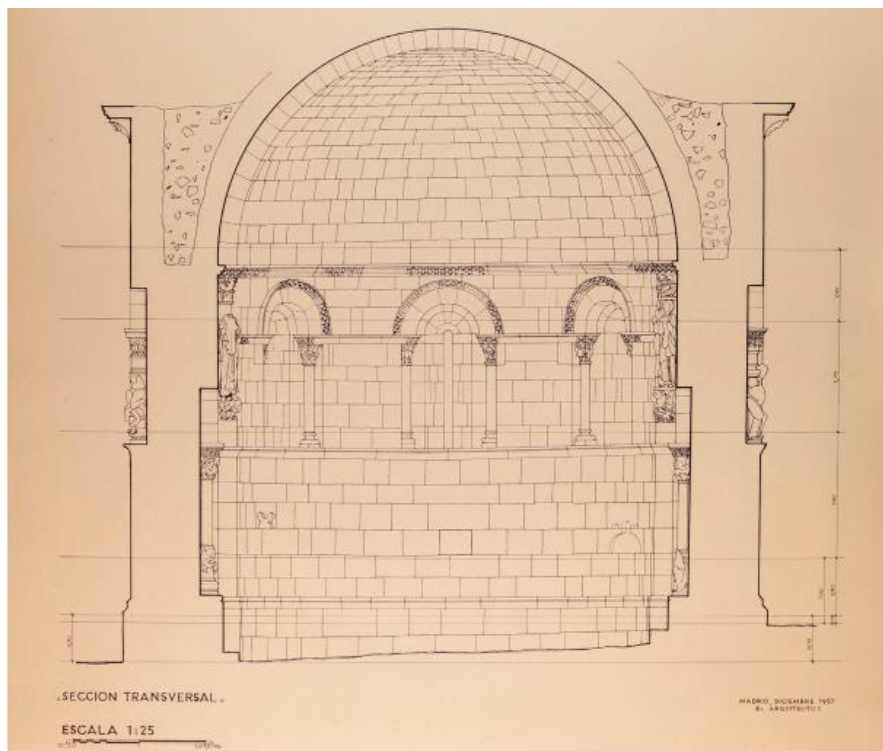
Planimetric drawings. Transversal Section. The MET Archive
